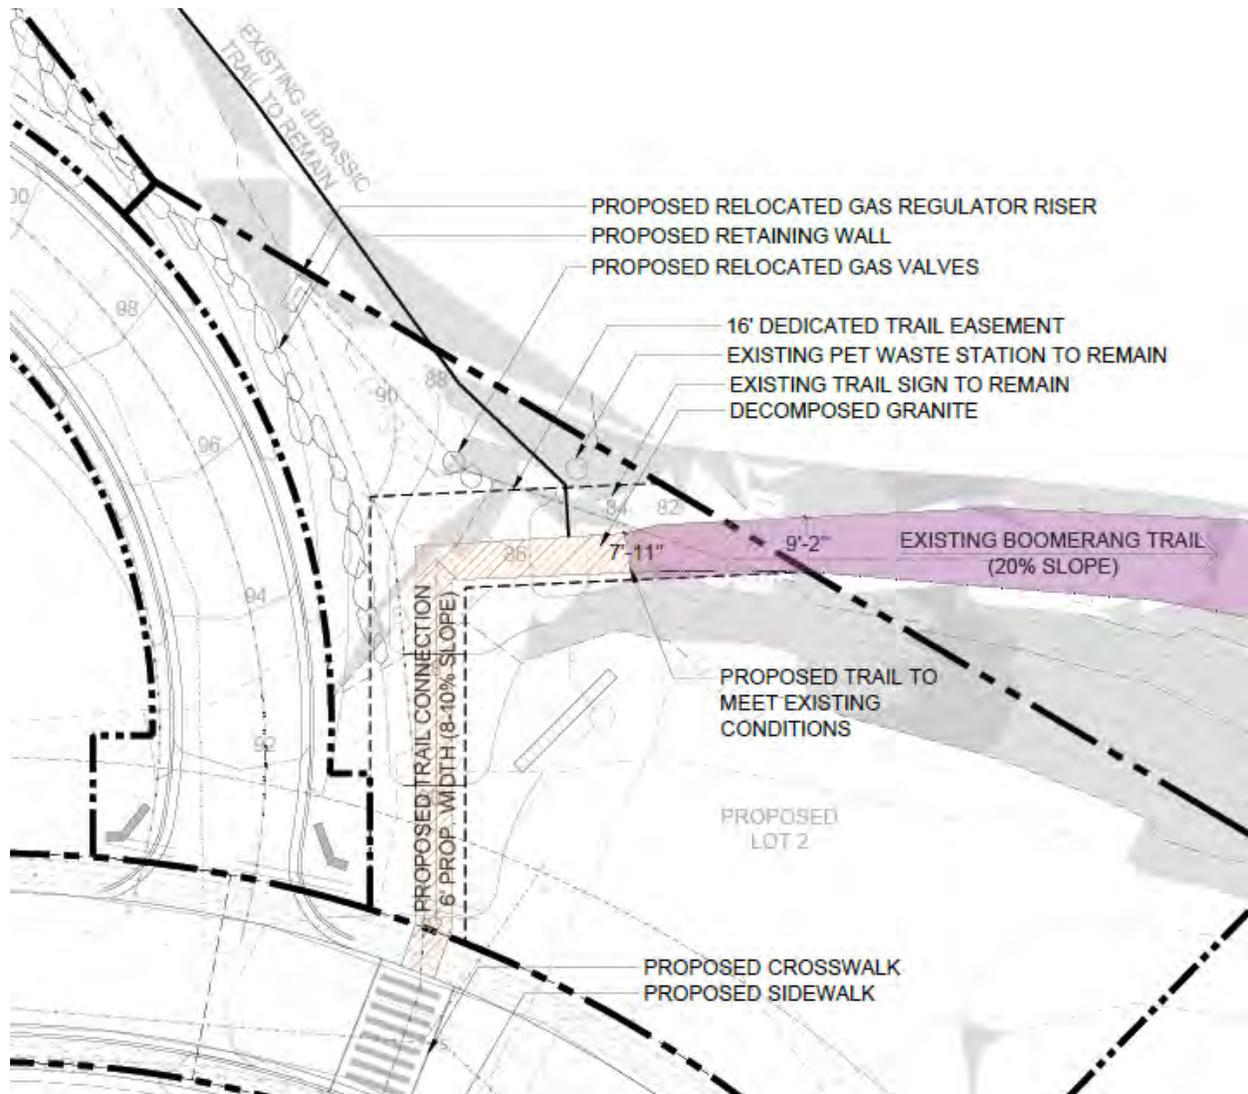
Image showing proposed easement and trail connection to Jurassic and Boomerang trails.
